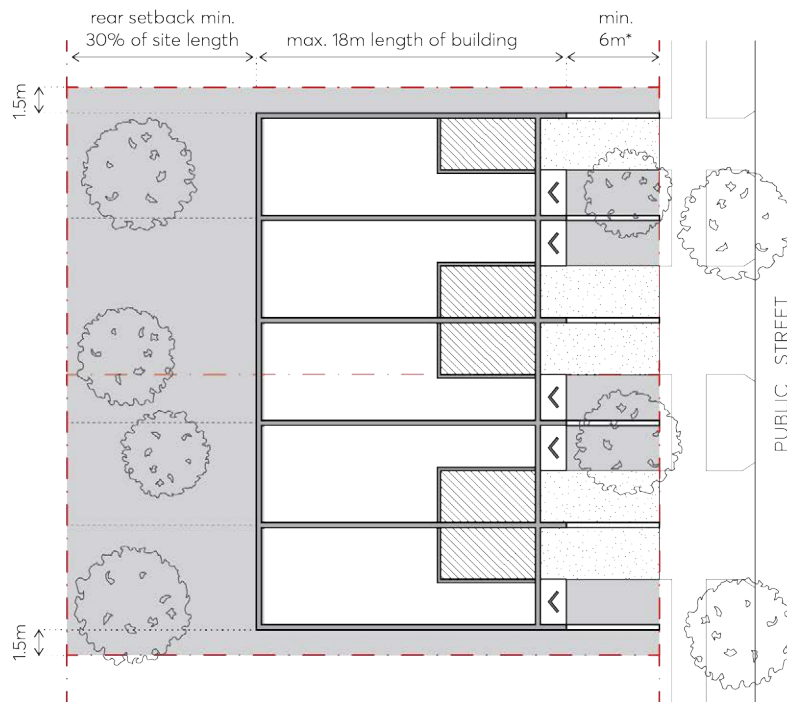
Terrace Housing Site Setbacks
